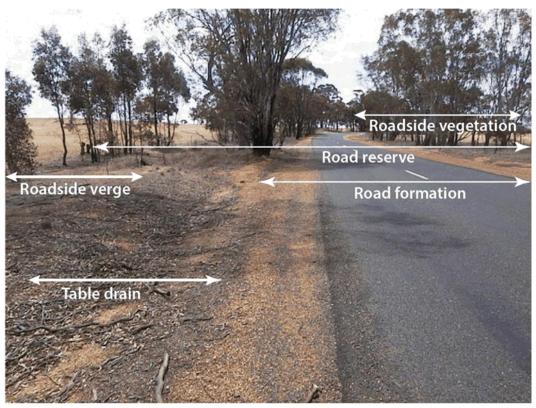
The components of a roadside: road reserve, road formation, road drainage system, roadside verge, vegetation and adjoining property
